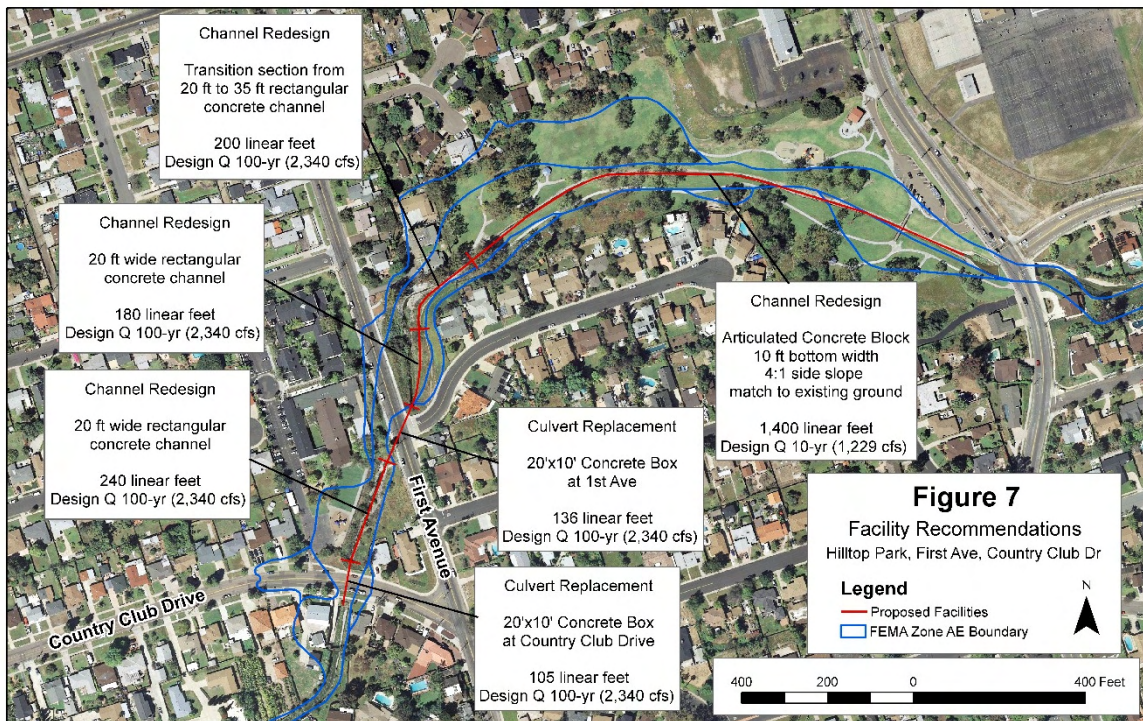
Facility Recommendation Locations – Hilltop Park, First Avenue, and Country Club Drive
